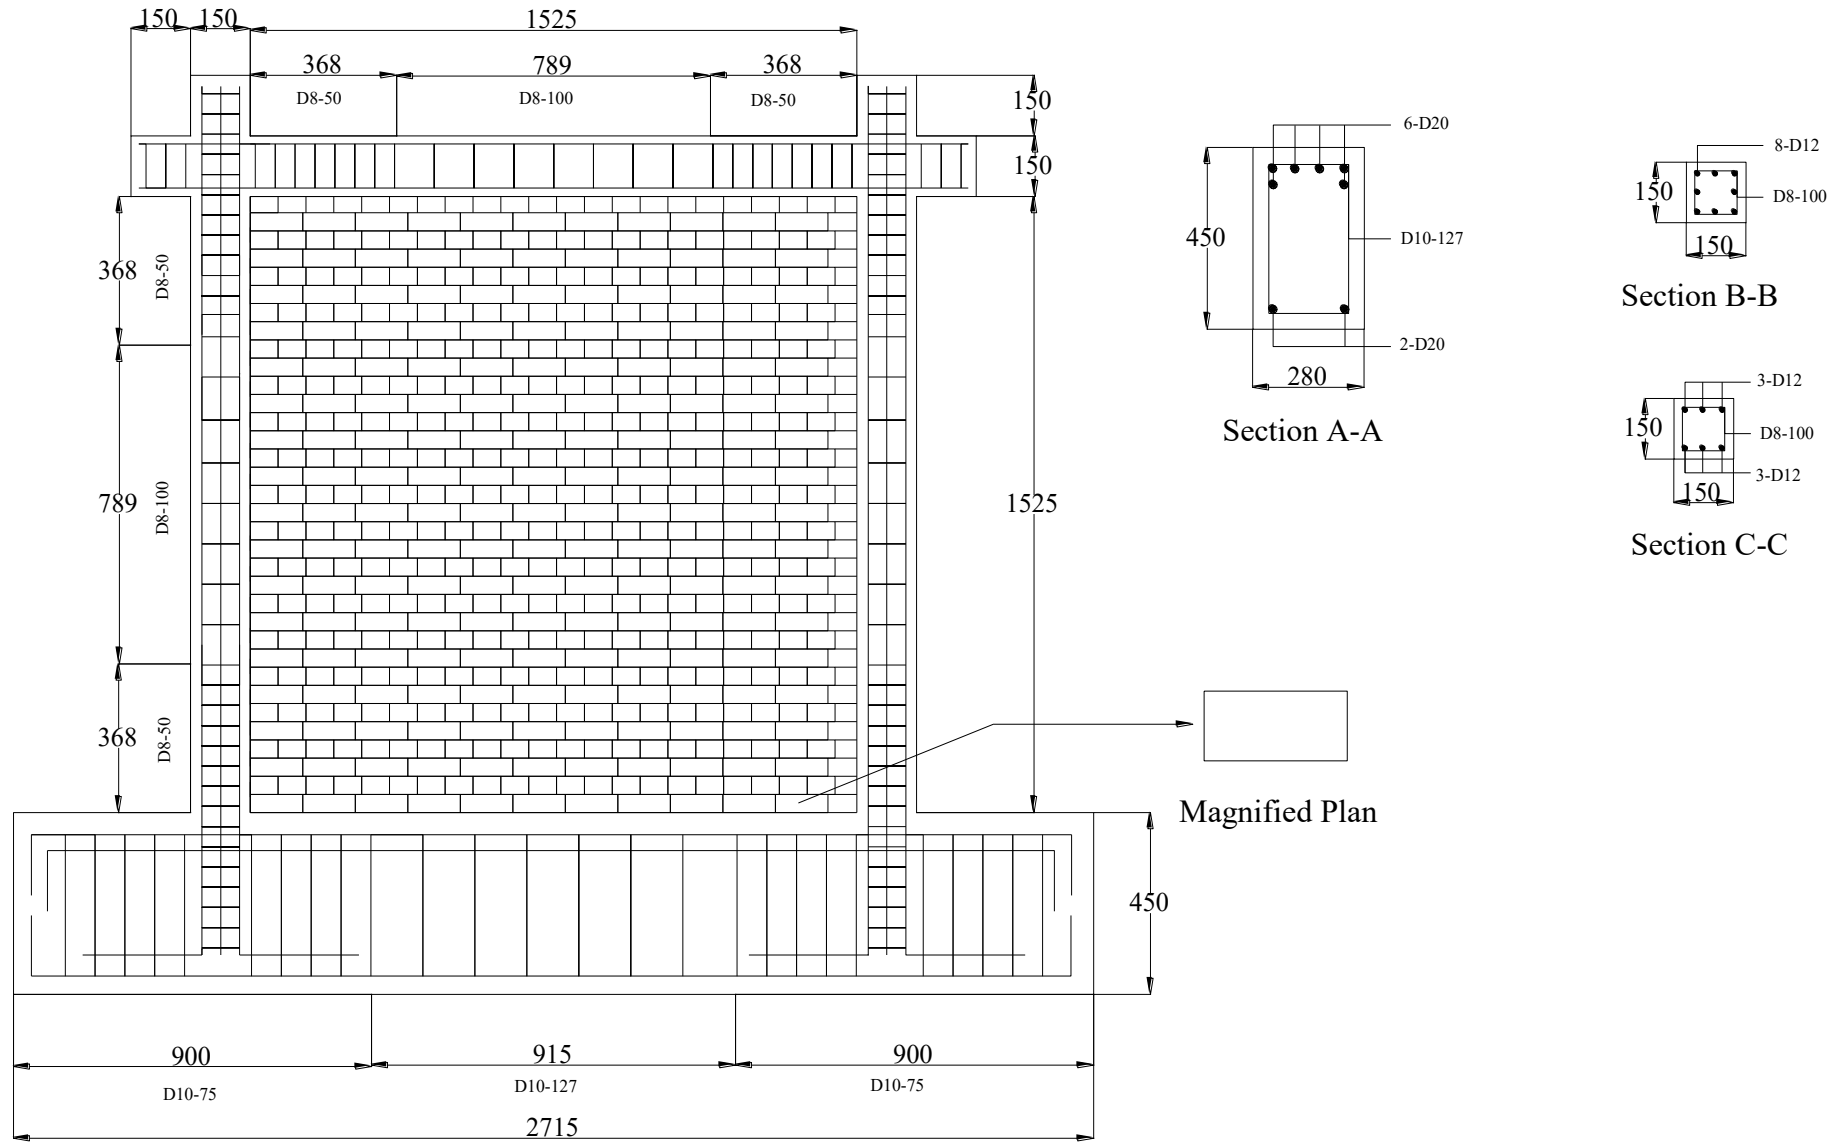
Schematic drawing of SB (Every unit is in mm) [Note: Section A-A, B-B and C-C are the midsection of base, column and beam respectively].
